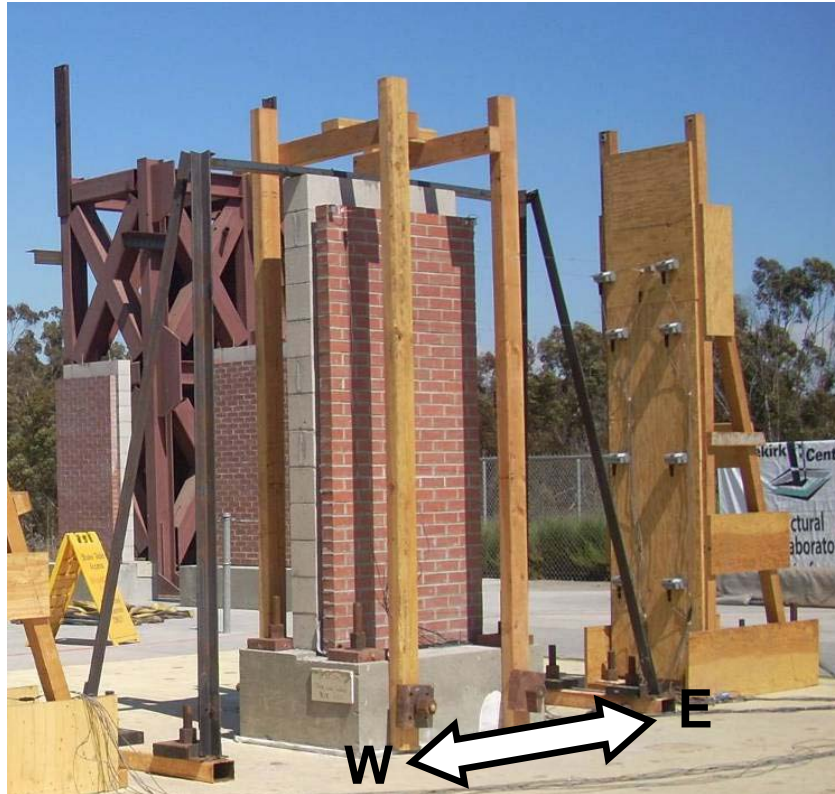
Typical shake-table, in-plane CMU wall specimen with test setup
